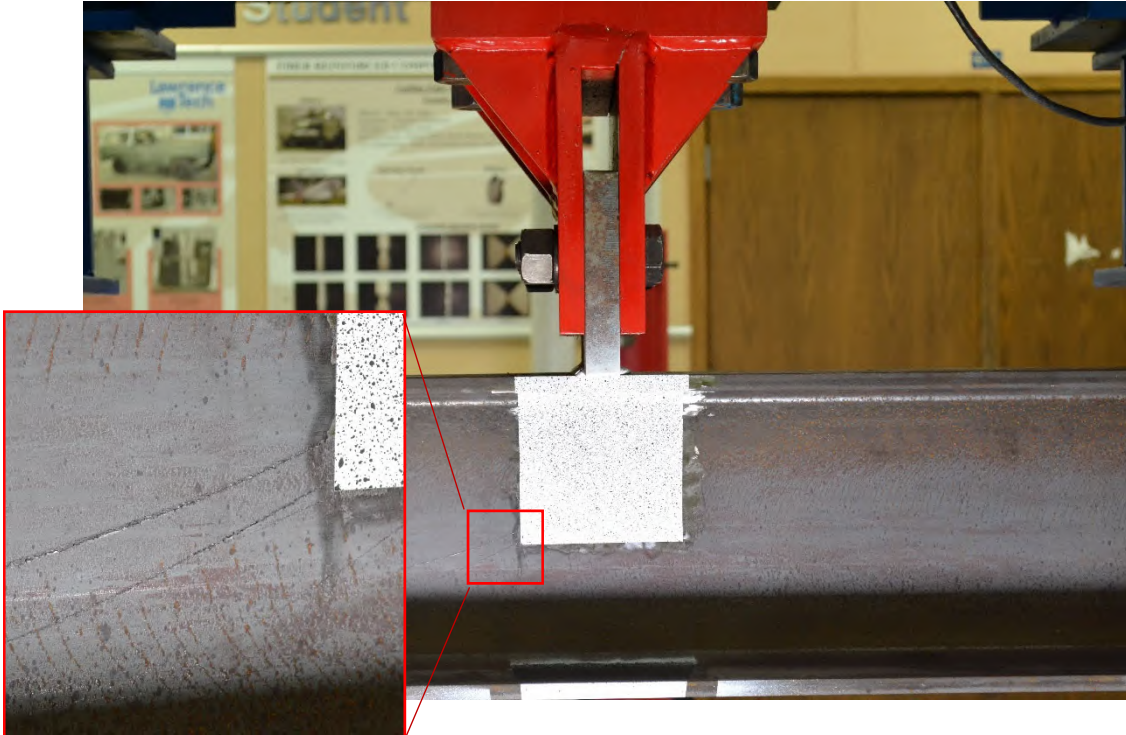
Weld condition of W16X31-ST-E0 after testing (Side 2)
